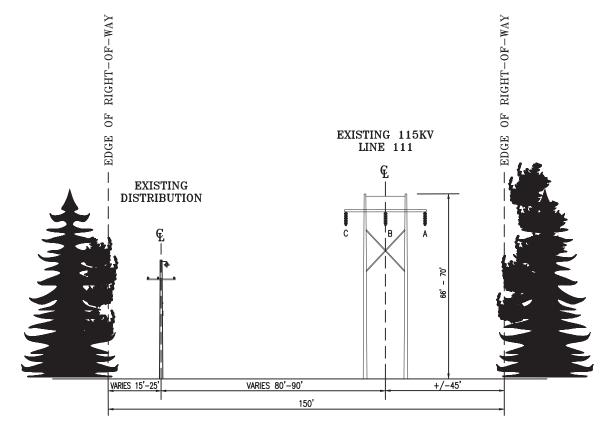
Typical ROW Cross-Sections / Plan & Profile Drawings
